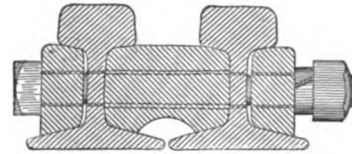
is a plan with cross sections of our Railroad Crossing, and shows the design of all angles for 48 to 90 degrees. The section illustrates the different styles of filling steel, which we letter sections A, B, and C, so that customers may be able to designate which section is desired.
